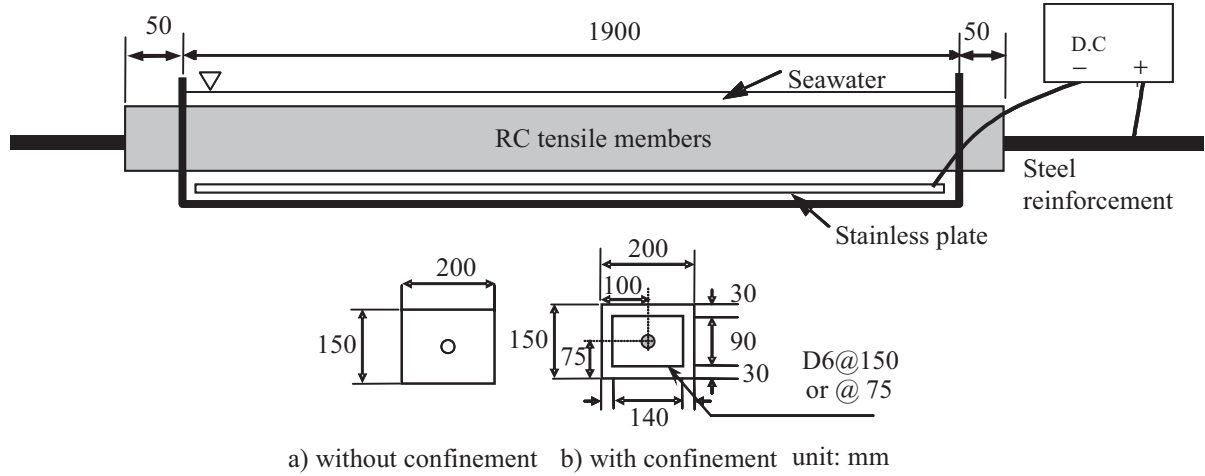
Dimension of Specimens and Impressed Current Deterioration
